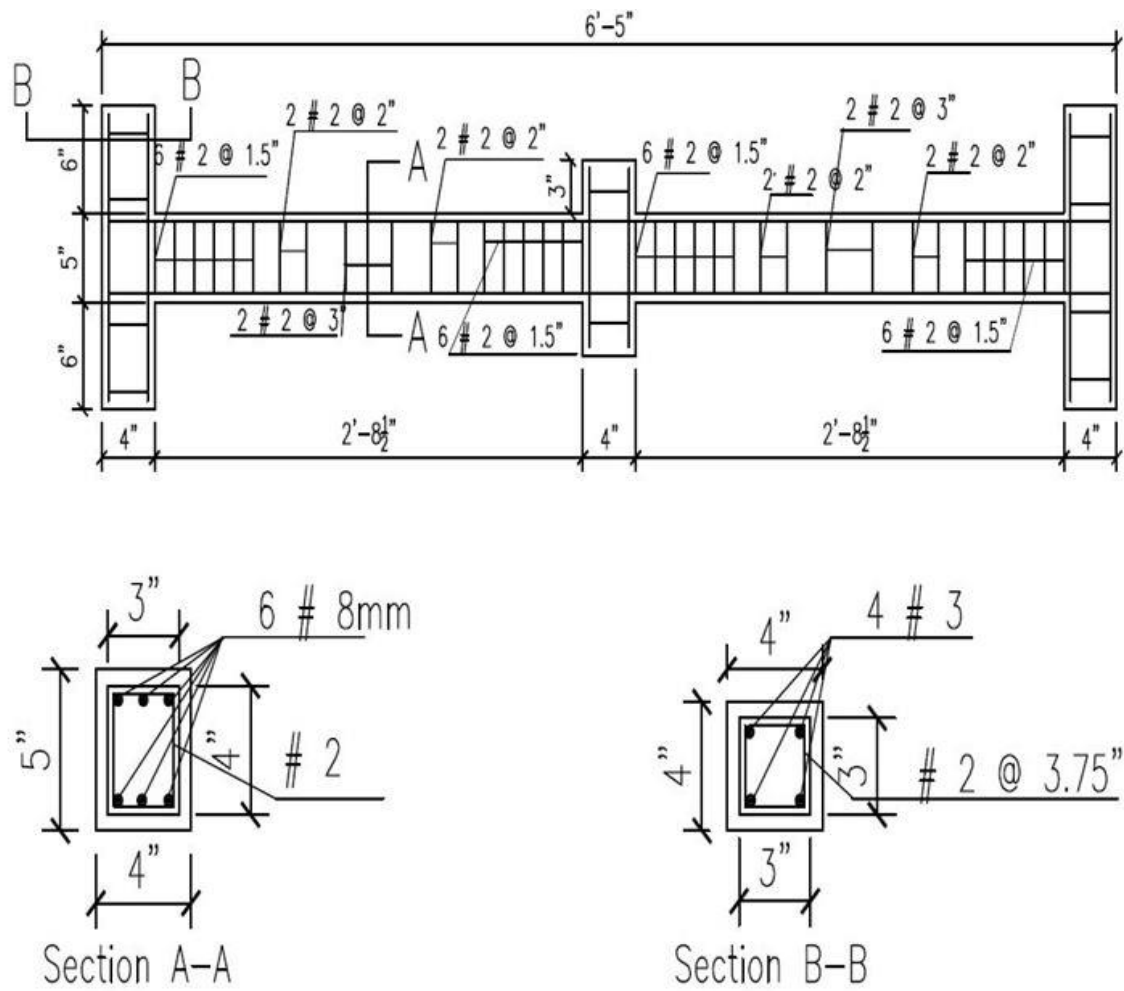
Typical Cross-section for Two-span Sub-assembly with BFRP Reinforcement and Seismic Detail
